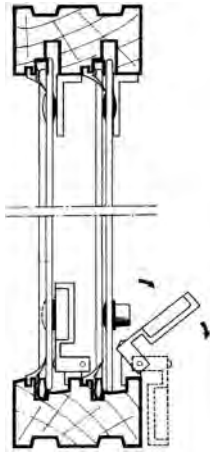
The Duetto double wall window with two toughened glass sheets and their operating and locking systems (Saint-Gobain Vitrage 1976: 137).
